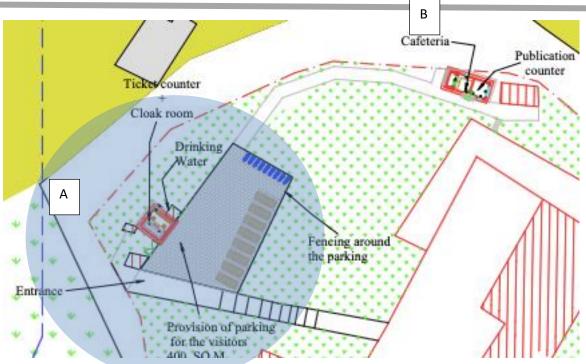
Concept plan for parking drinking water cloak room at the entrance of the site from Ramnagar Gate on west
